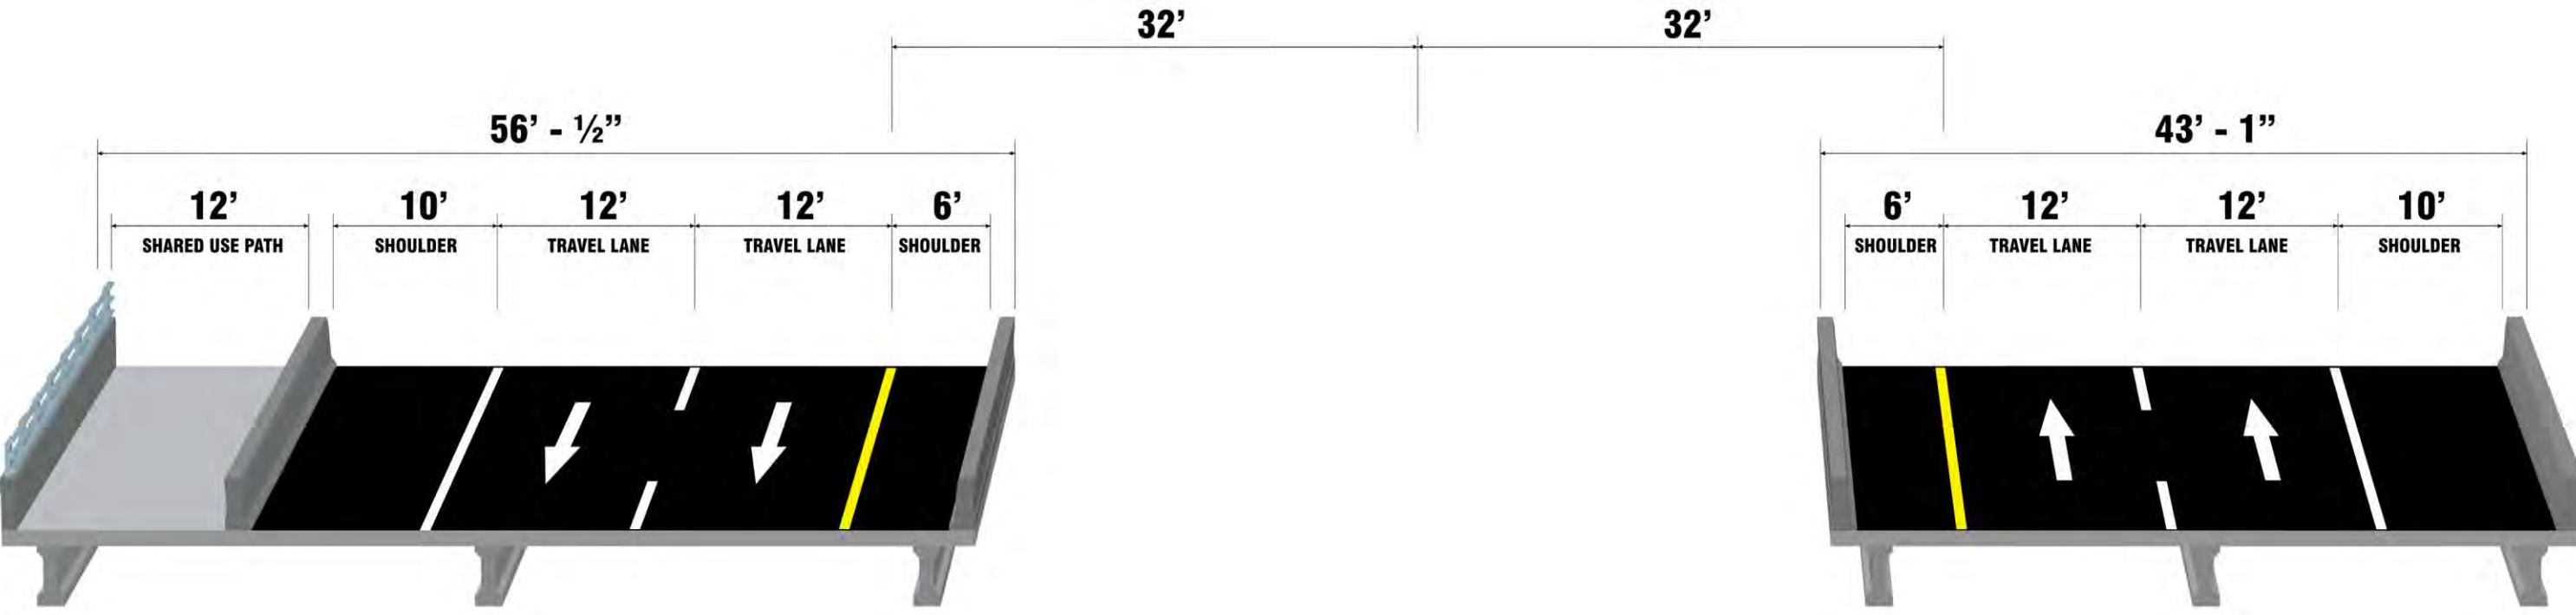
Proposed Ultimate Bridge Typical Sections
